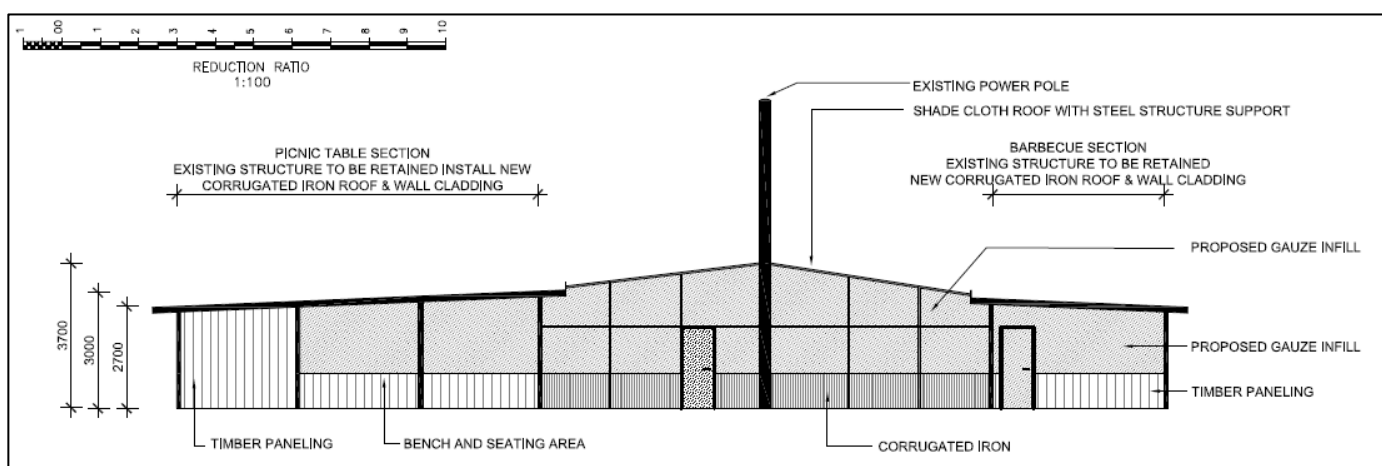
Elevation of Proposed Barbecue and Picnic Shelter
